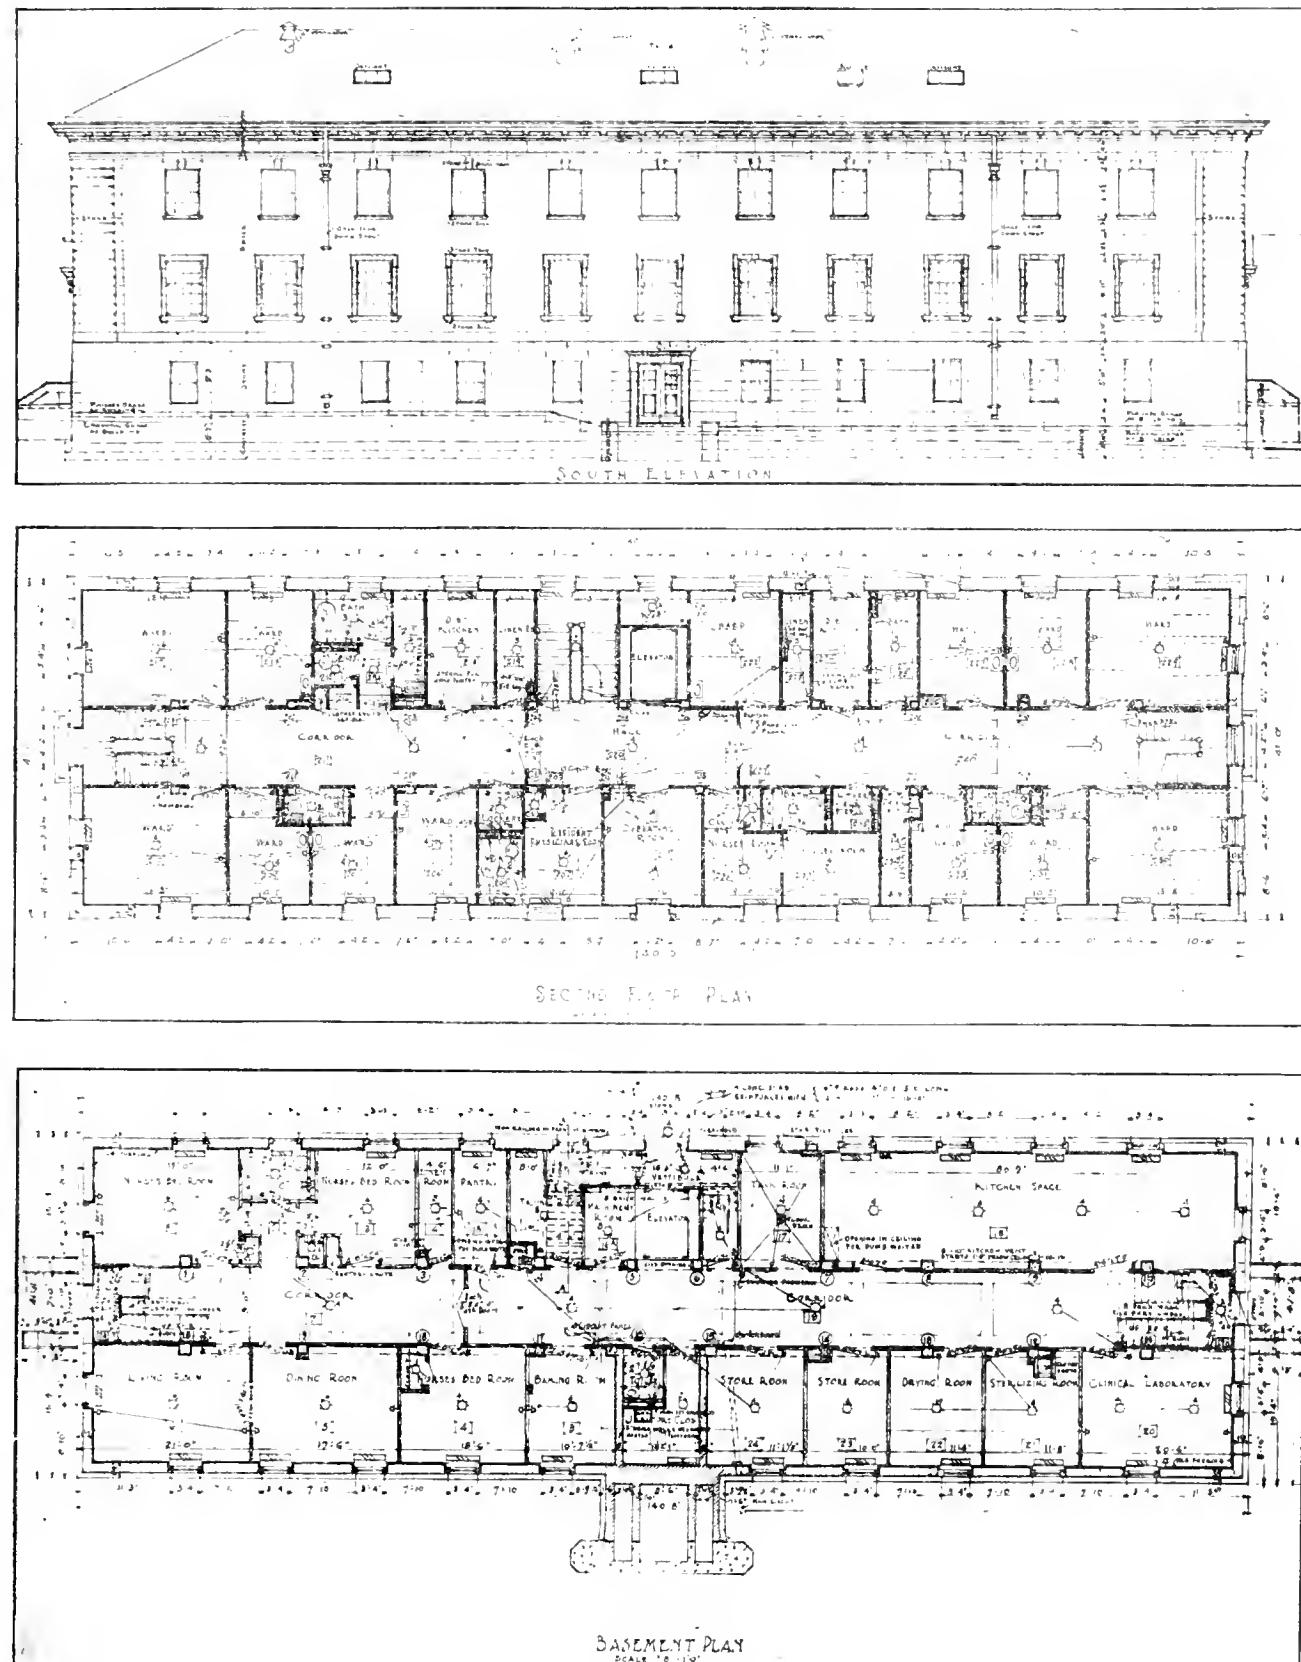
Elevation, second floor and basement plans of University Infirmary.
